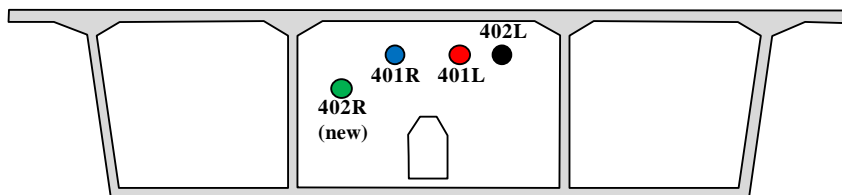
Horizontal tendon sections at an anchor block in the mid-span.
